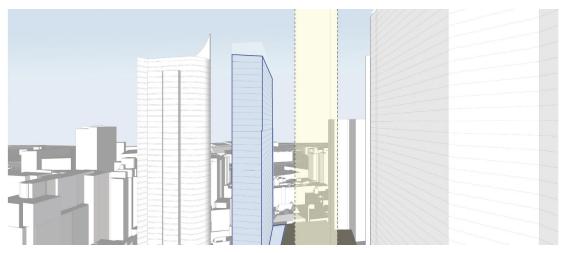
View B. View Perspective - 343-357 Pitt Street, Century Tower
